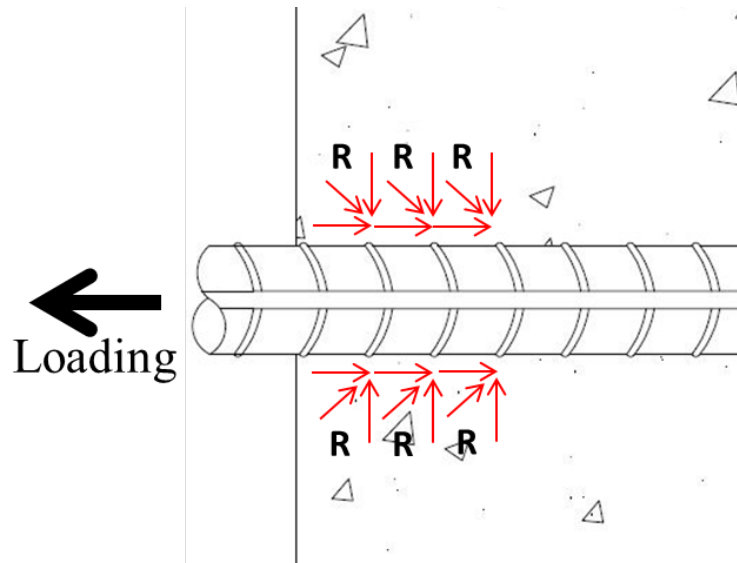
Idealized Reaction of Reinforcing Steel Embedded in Concrete, Subjected to Tension, Cross Sectional View
